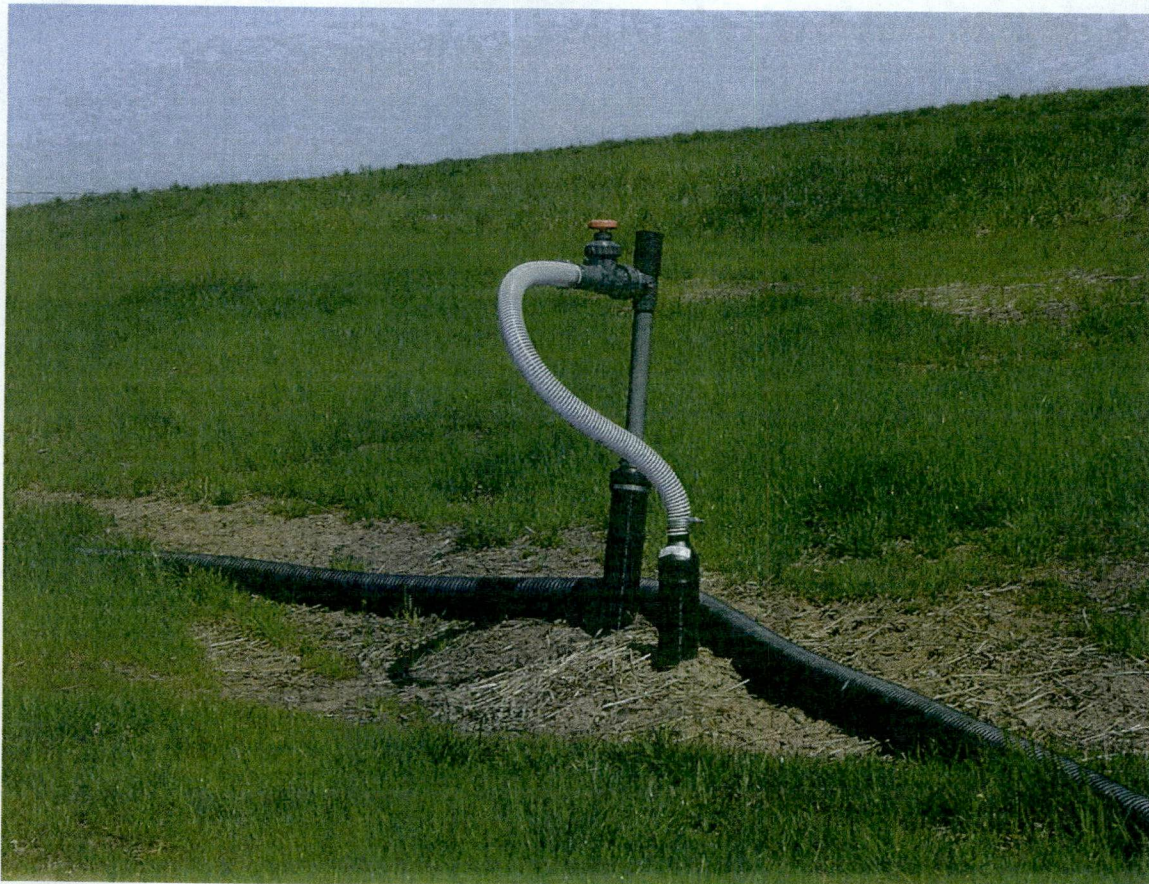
View of original vapor recovery piping with duct tape connections.
